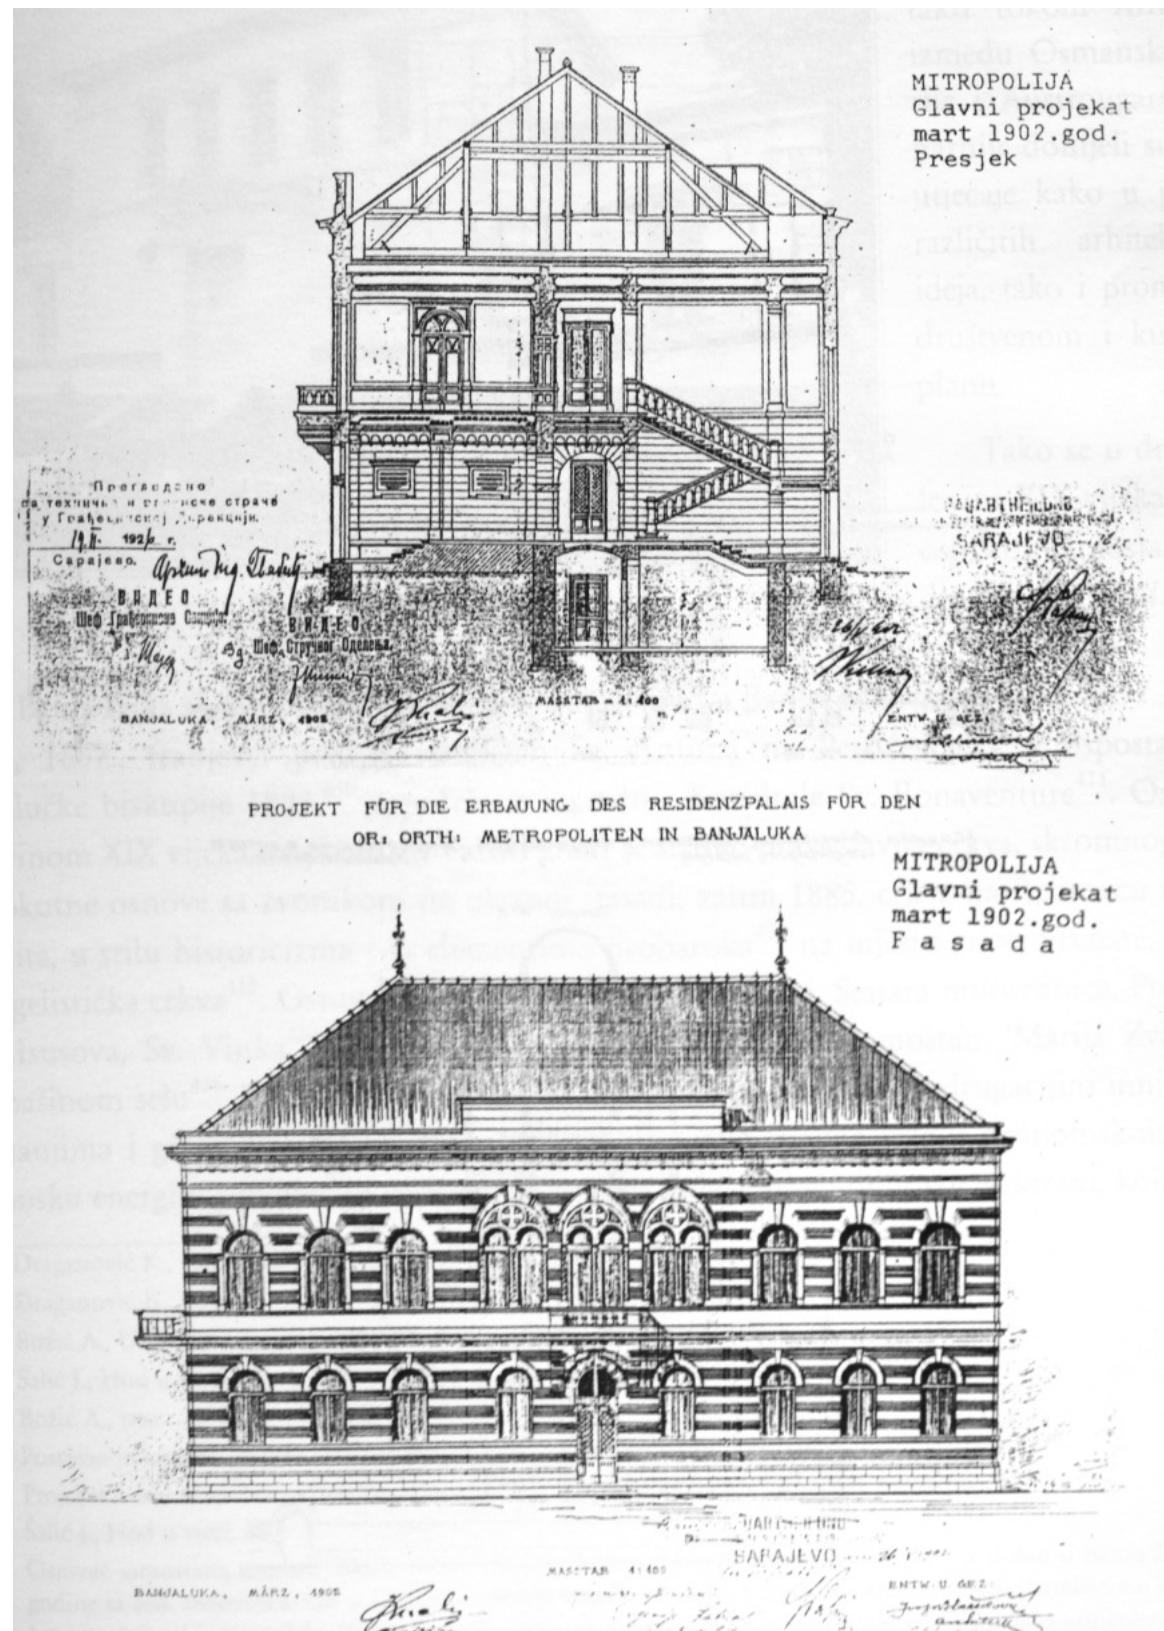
Metropolitan Palace, original project; cross section and elevation view from south.
